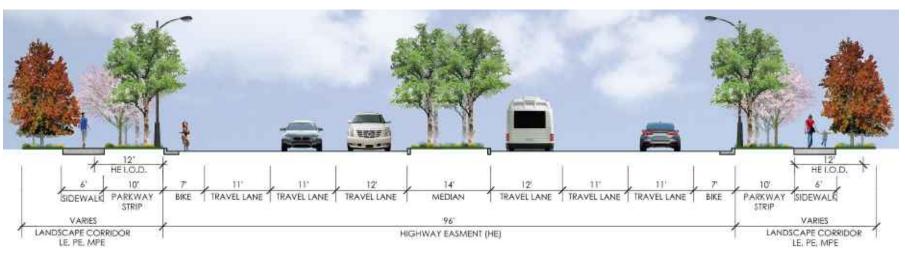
Sunset Boulevard- Section A, 6-Lane Arterial with median (SR 65 to S. Loop Road) LE = landscape easement, PE = pedestrian easement, MPE = multi-purpose easement
